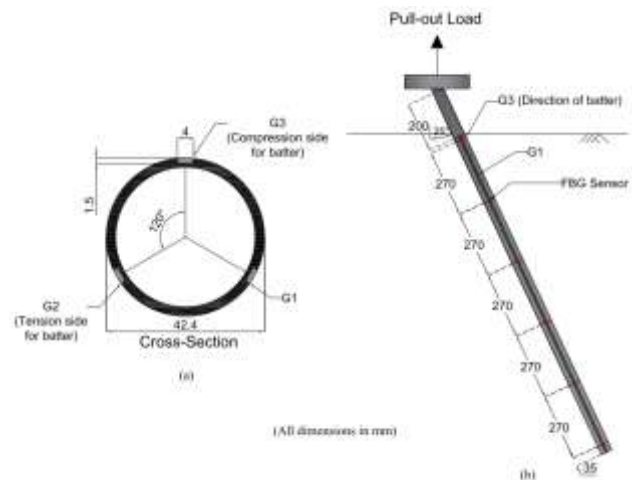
Dimension of grooves along test pile's shaft and layout of FBG sensors inside the pile: (a) Cross-section of pile and configuration of grooves; (b) layout of FBG sensors along battered mini pile length.
